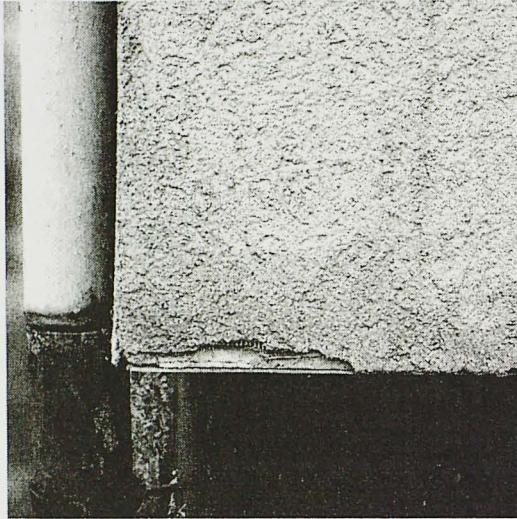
Example of a damage in the lower area of the façade on the western side of object 31 by permeation of moisture at the connection profile (maybe influenced by a defective rain-water pipe). Such damages should be repaired early enough and separately from other general façade refurbishments
